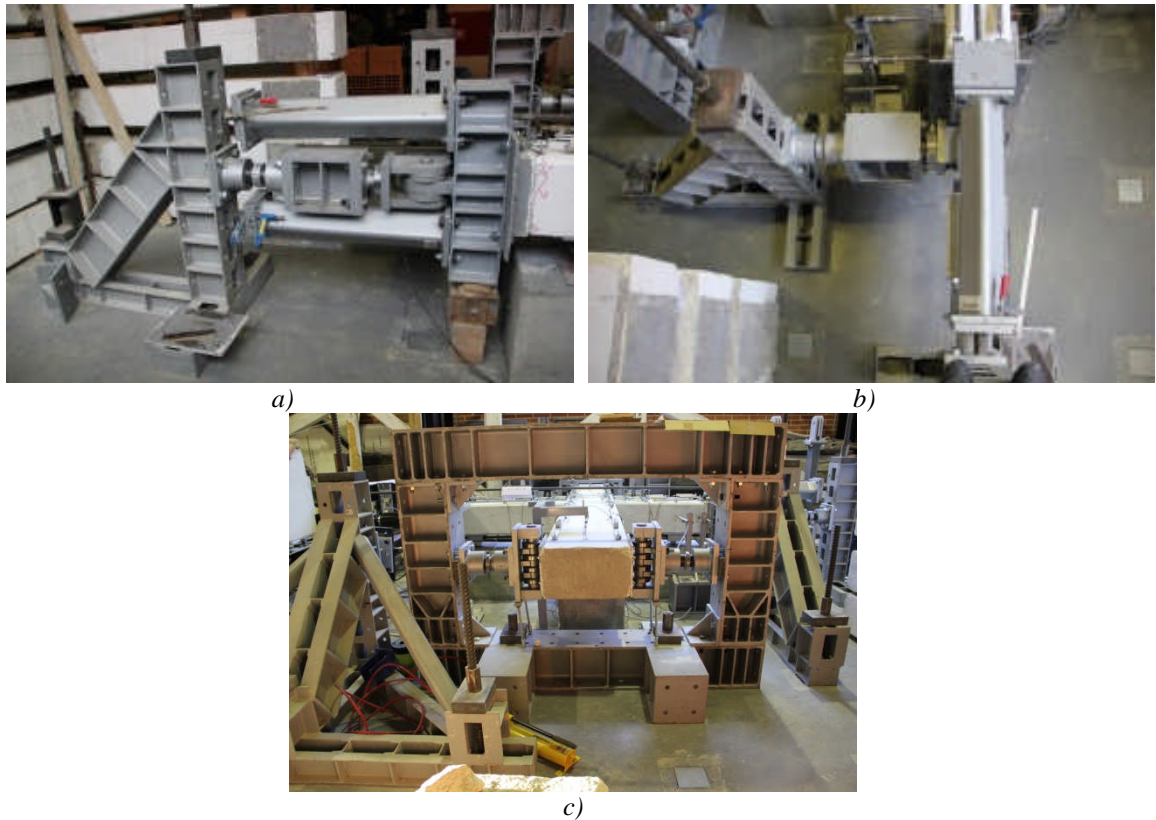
a) side view of the steel frame extension with the lower column in a beam-column specimen; b) a plan view of the frame restraining lateral displacement in any direction except gravity of beam-column connection specimen; c) linear bearings and support frame restraining displacement of beams in the upper direction at the assumed point of contra-flexure.
